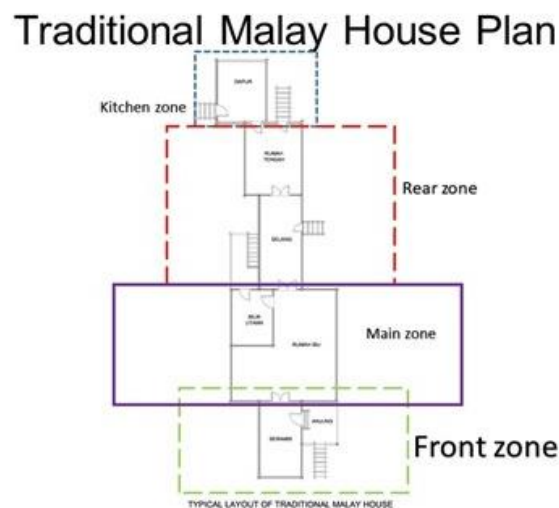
Typical Traditional Malay house layout (Hoseini, 2014)
